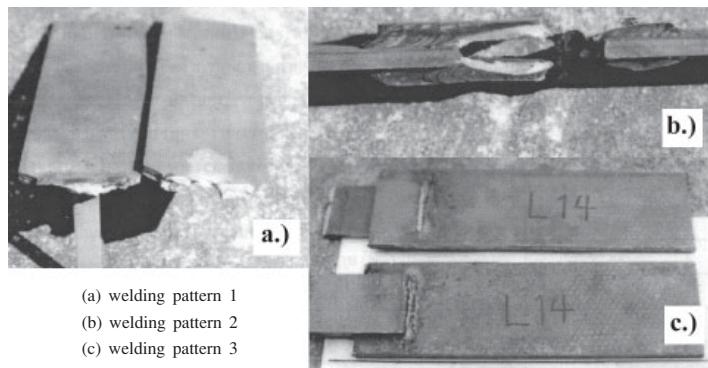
Typical mode of failure of welded connection specimens.
